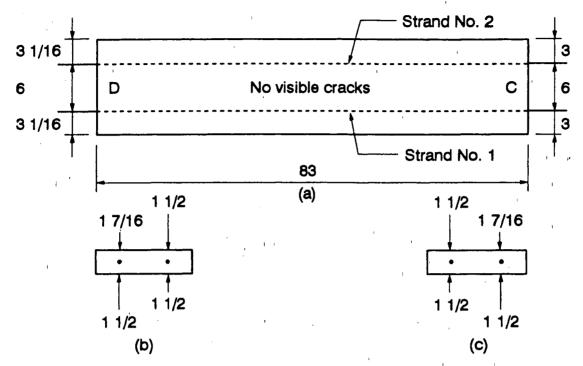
Specimen No. 3-3.0TC-7 (dimensions shown in inches):
